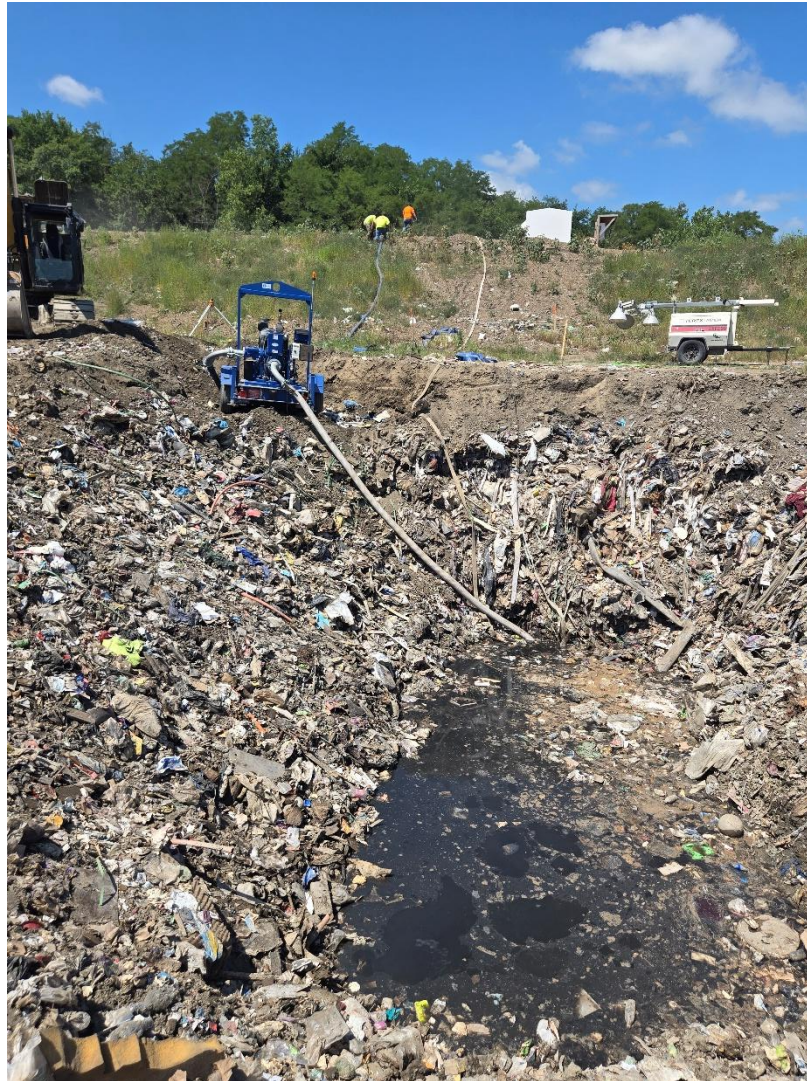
Initial excavation showing leachate level, looking west, 07-14-26.
